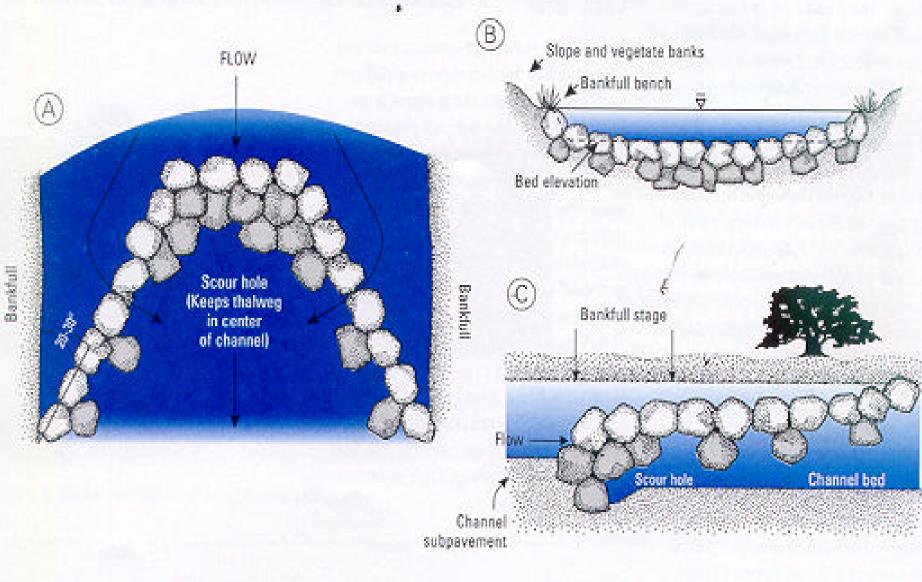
(a) Plan view, (b) cross-section, and (c) profile views of cross vane.
